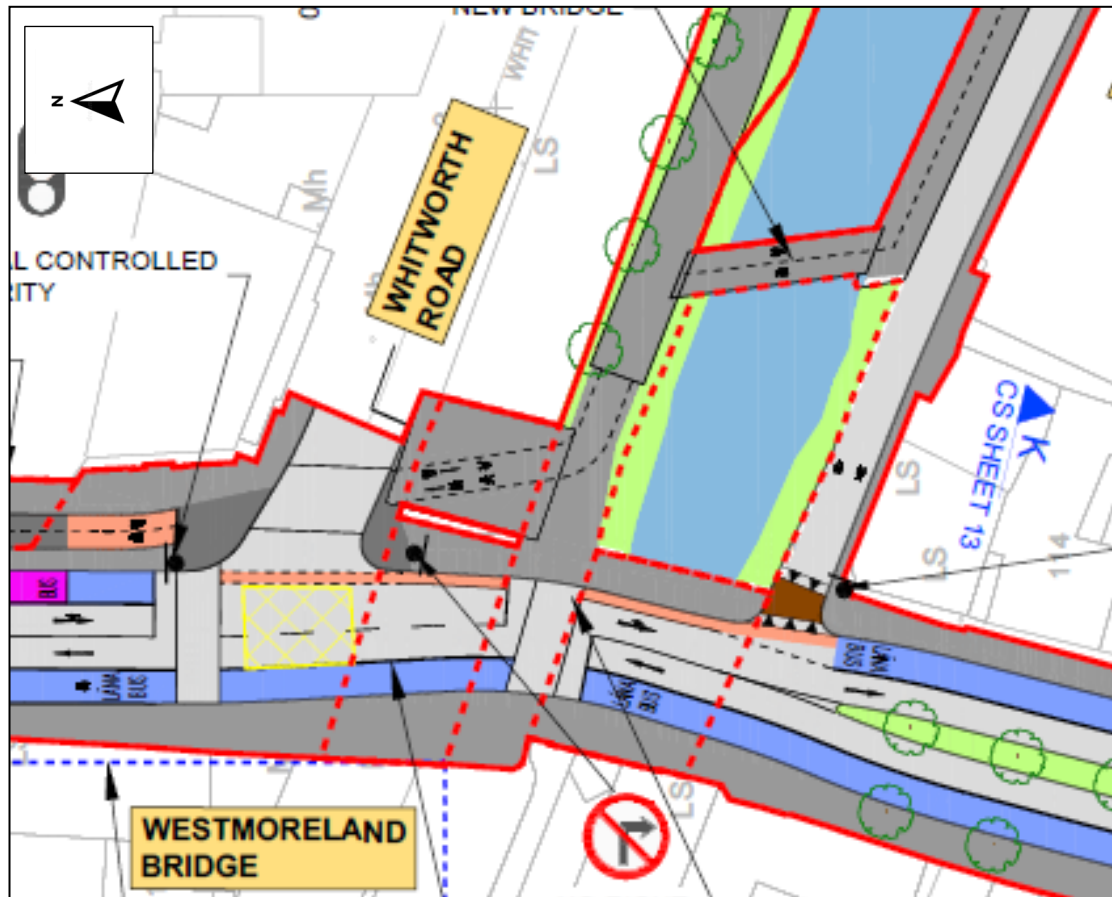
Extract from General Arrangement Drawing Sheet 13 at Whitworth Road
